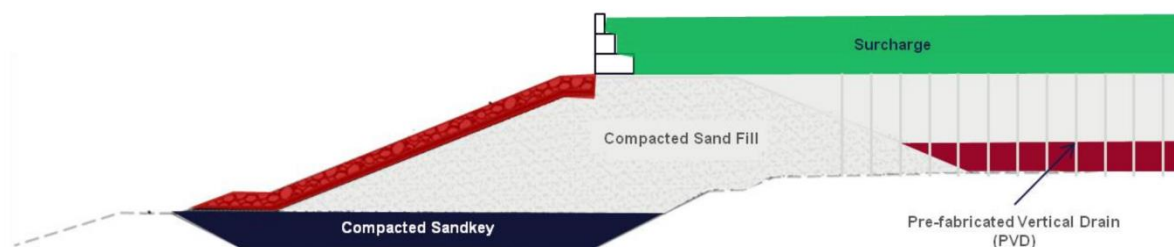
Typical cross section of surcharge with PVDs Installation
